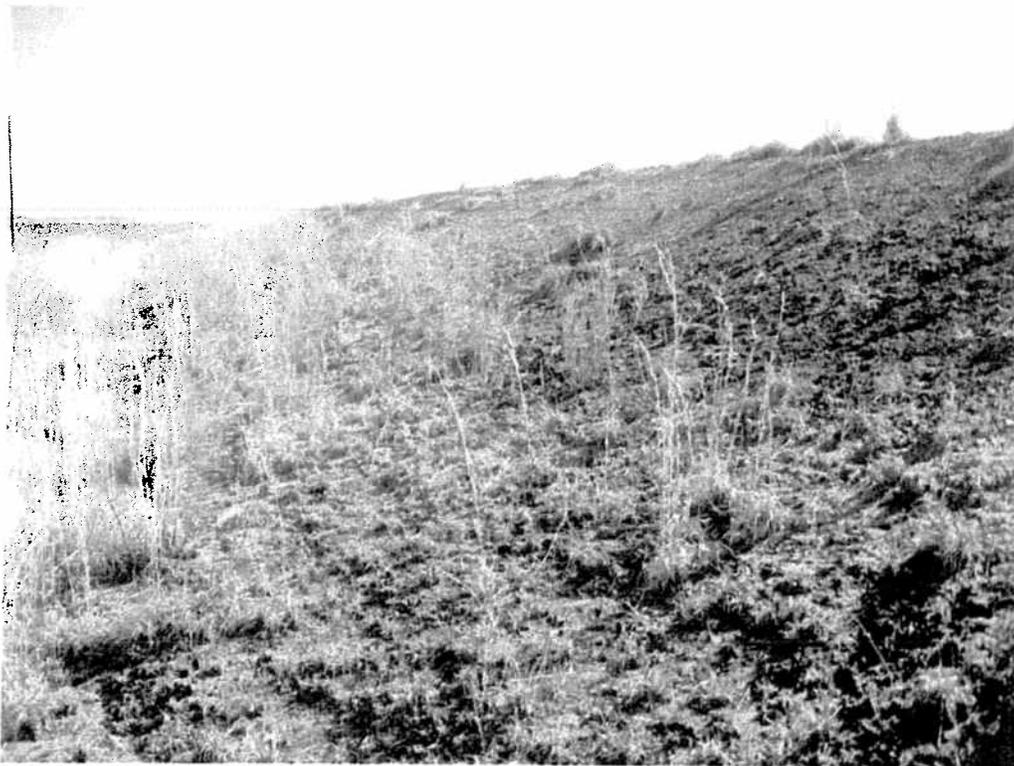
Vegetation on Upstream Face of Embankment, West Dike
